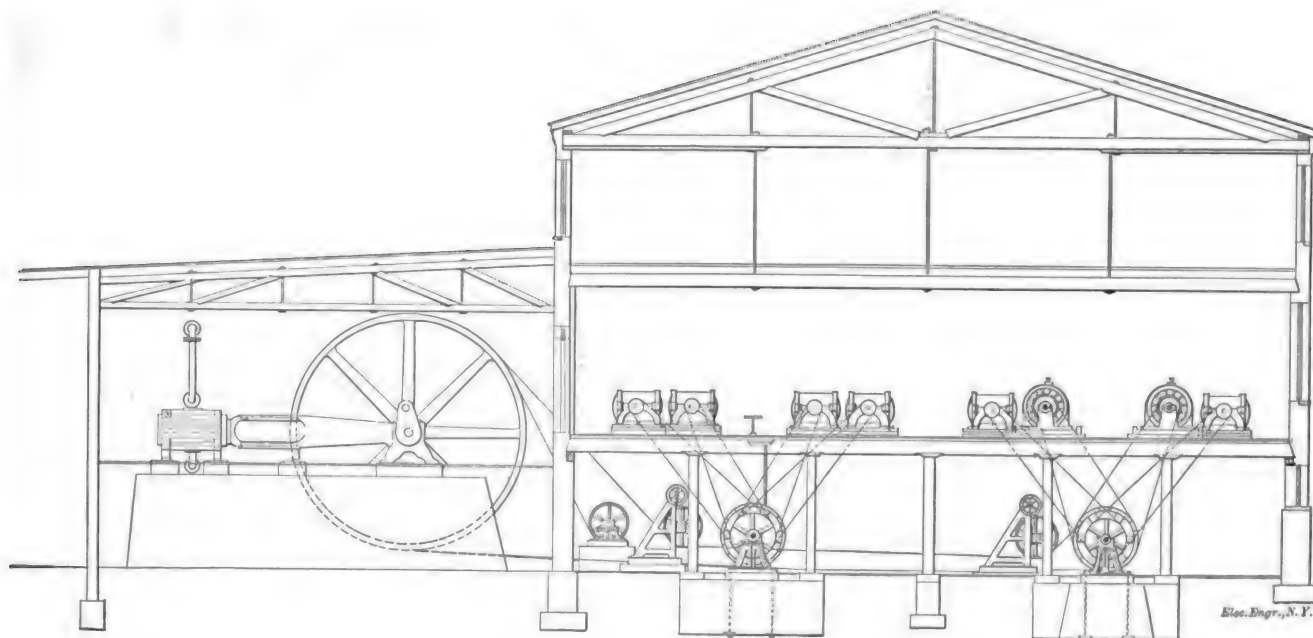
ENGINE AND DYNAMO ARRANGEMENT, ELEVATION.—WORCESTER, MASS., ELECTRIC LIGHT STATION.
